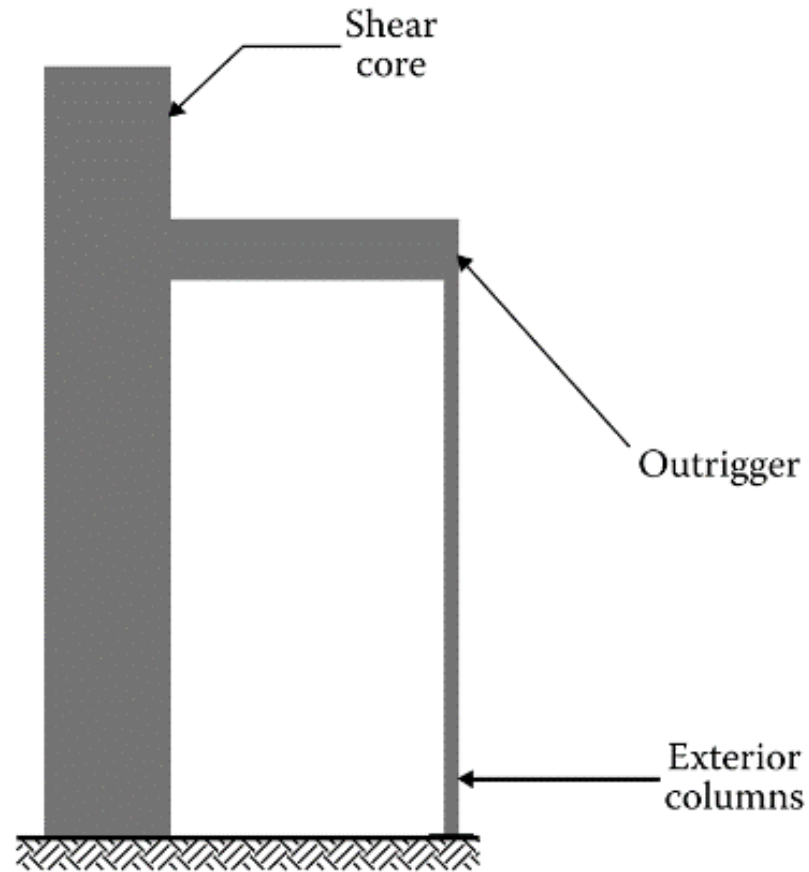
Outrigger and belt wall system with an offset core.
